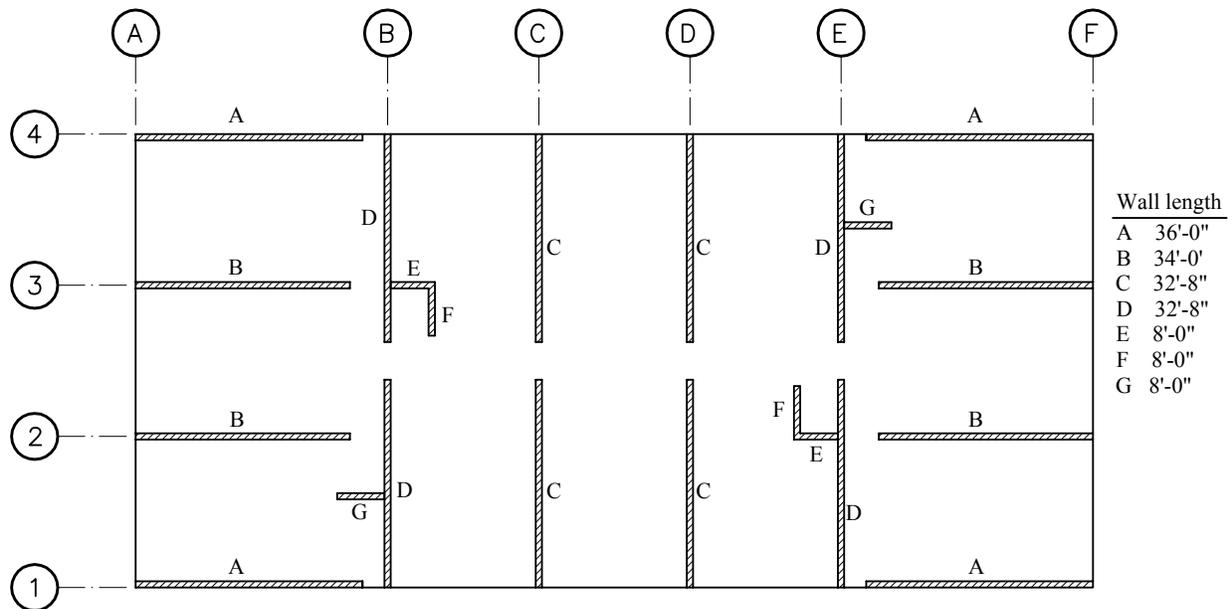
Plan of walls (1.0 ft = 0.3048 m).
